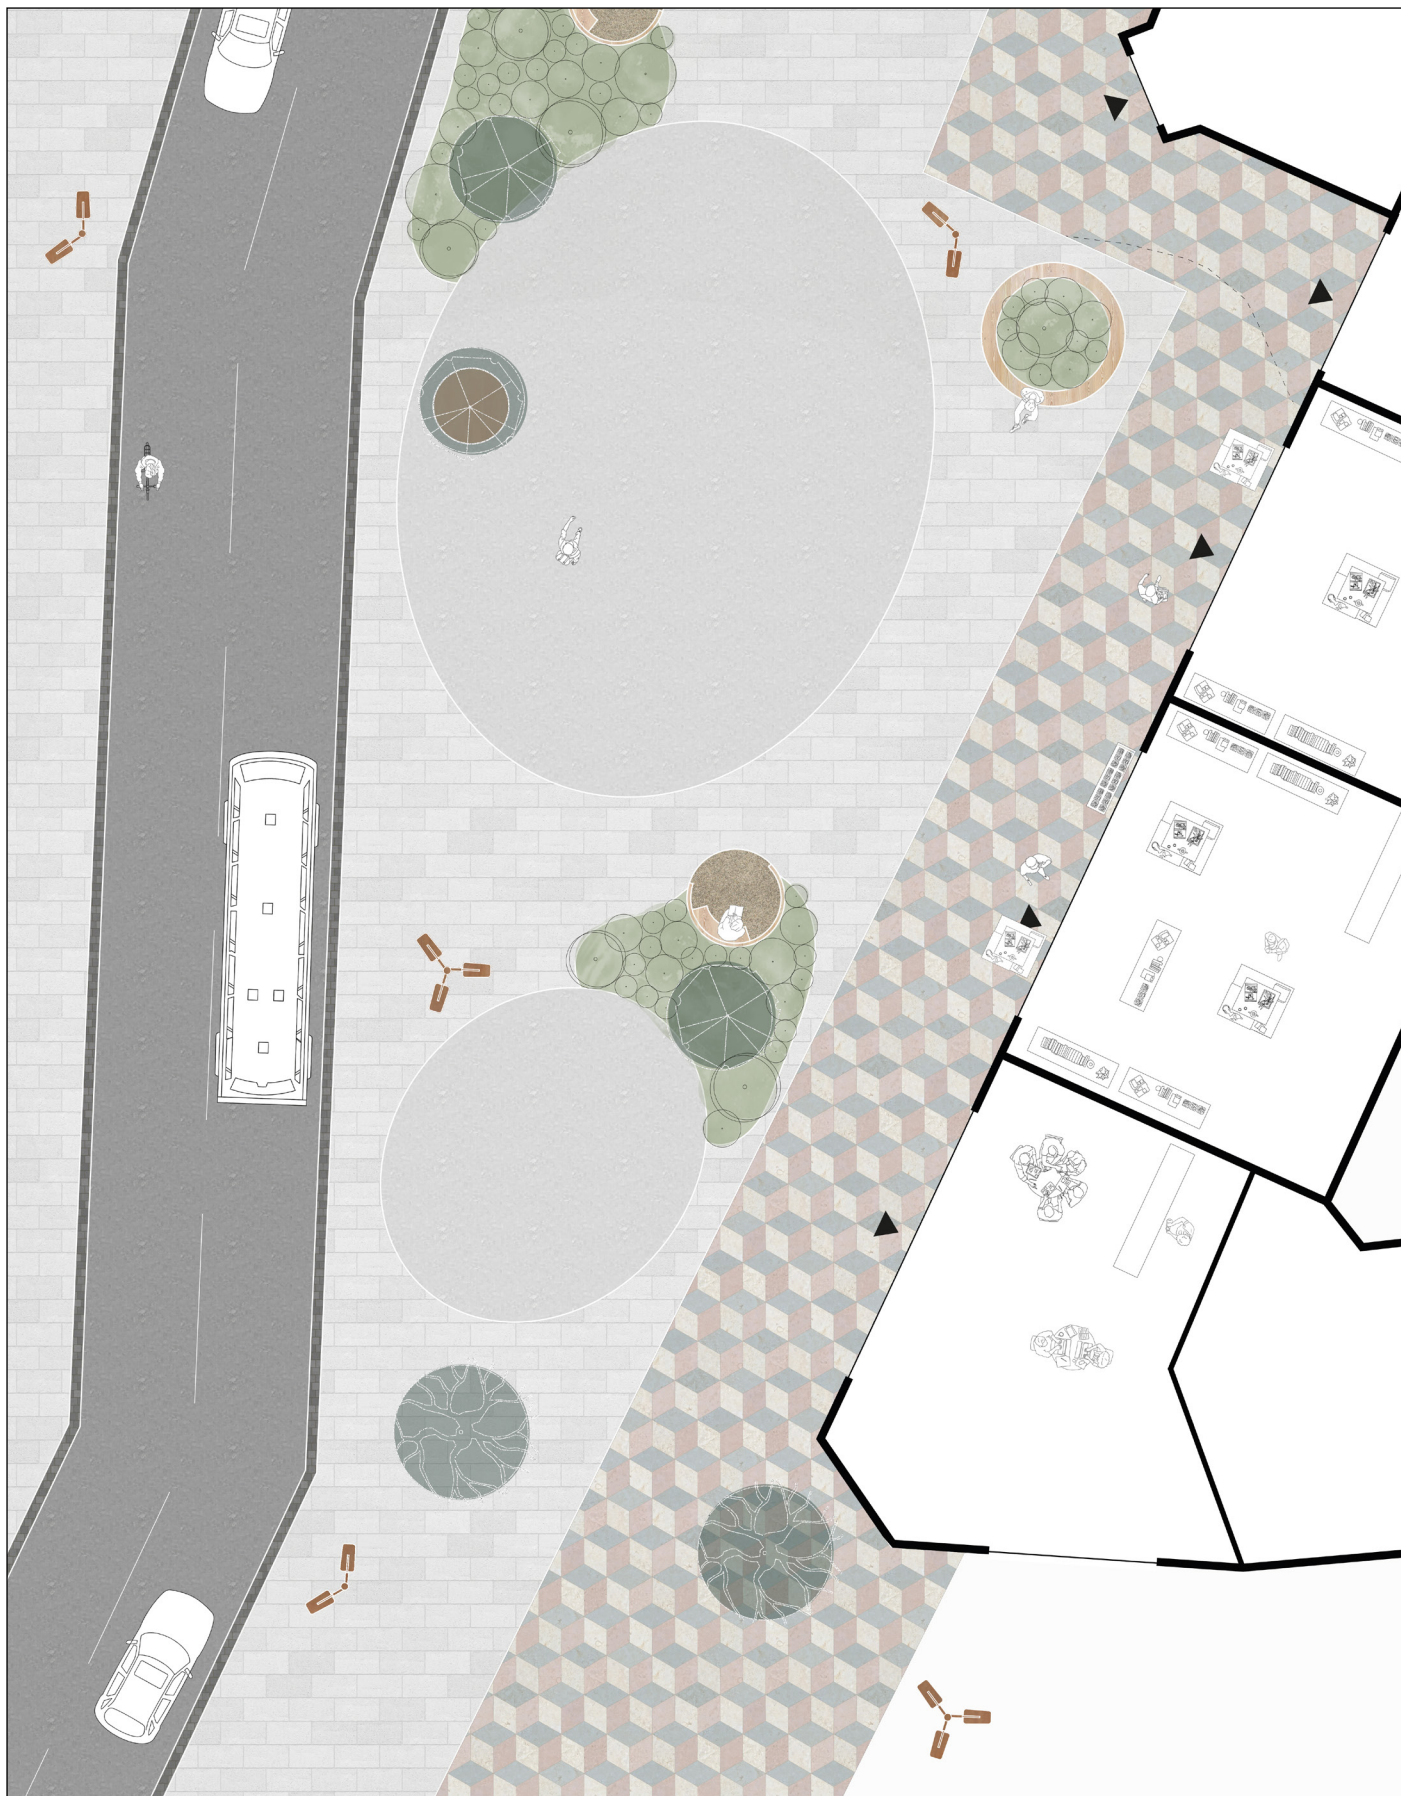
Zoom plan C showing Markedspladsen and the indoor-outdoor connection between Gågaden and shops 1:200
